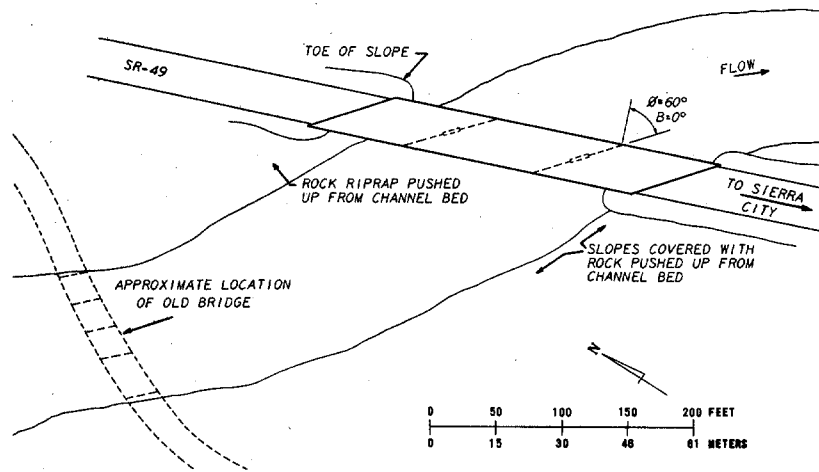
Plan of Salmon Creek bridge, built in 1964.
